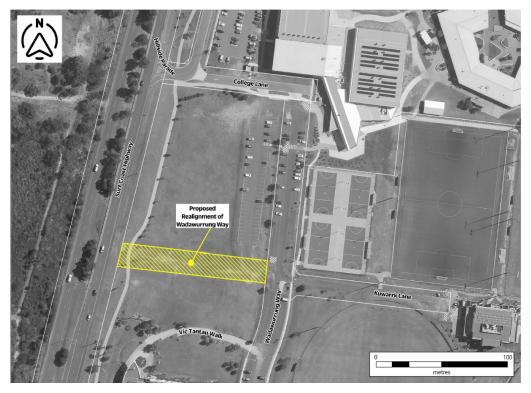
Proposed re-alignment of Wadawurrung Way, Torquay
